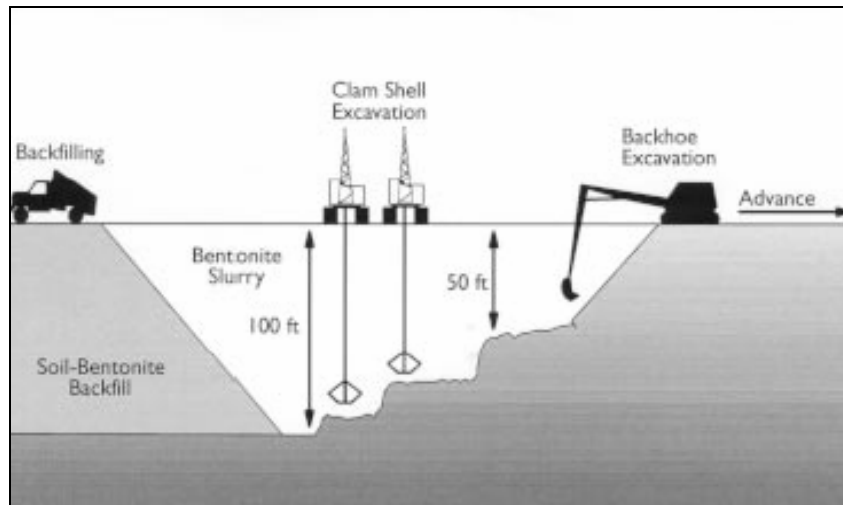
, Schematic drawing showing slurry wall construction methods, backhoe and clamshell excavation and surface backfill method.
